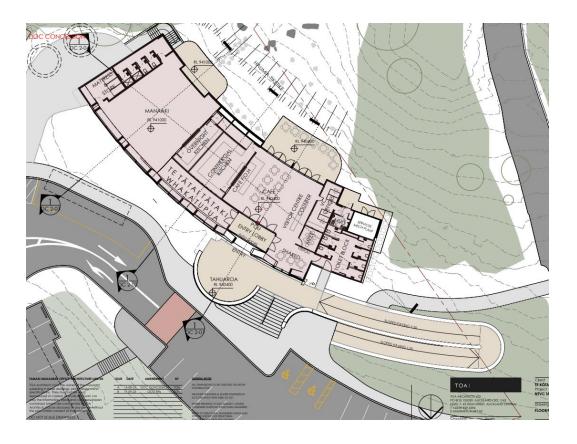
Proposed Floor Plan in relation to surveyed road boundary⁸
